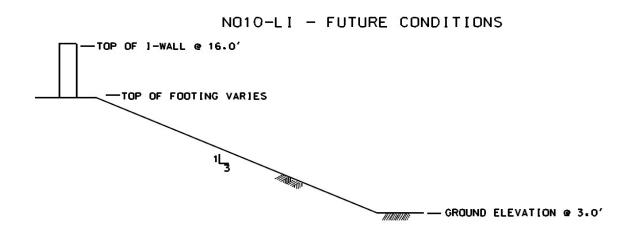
Typical Levee Design Cross-sections Topaz Street Levee/Floodwall Combination (NO10-LI)
